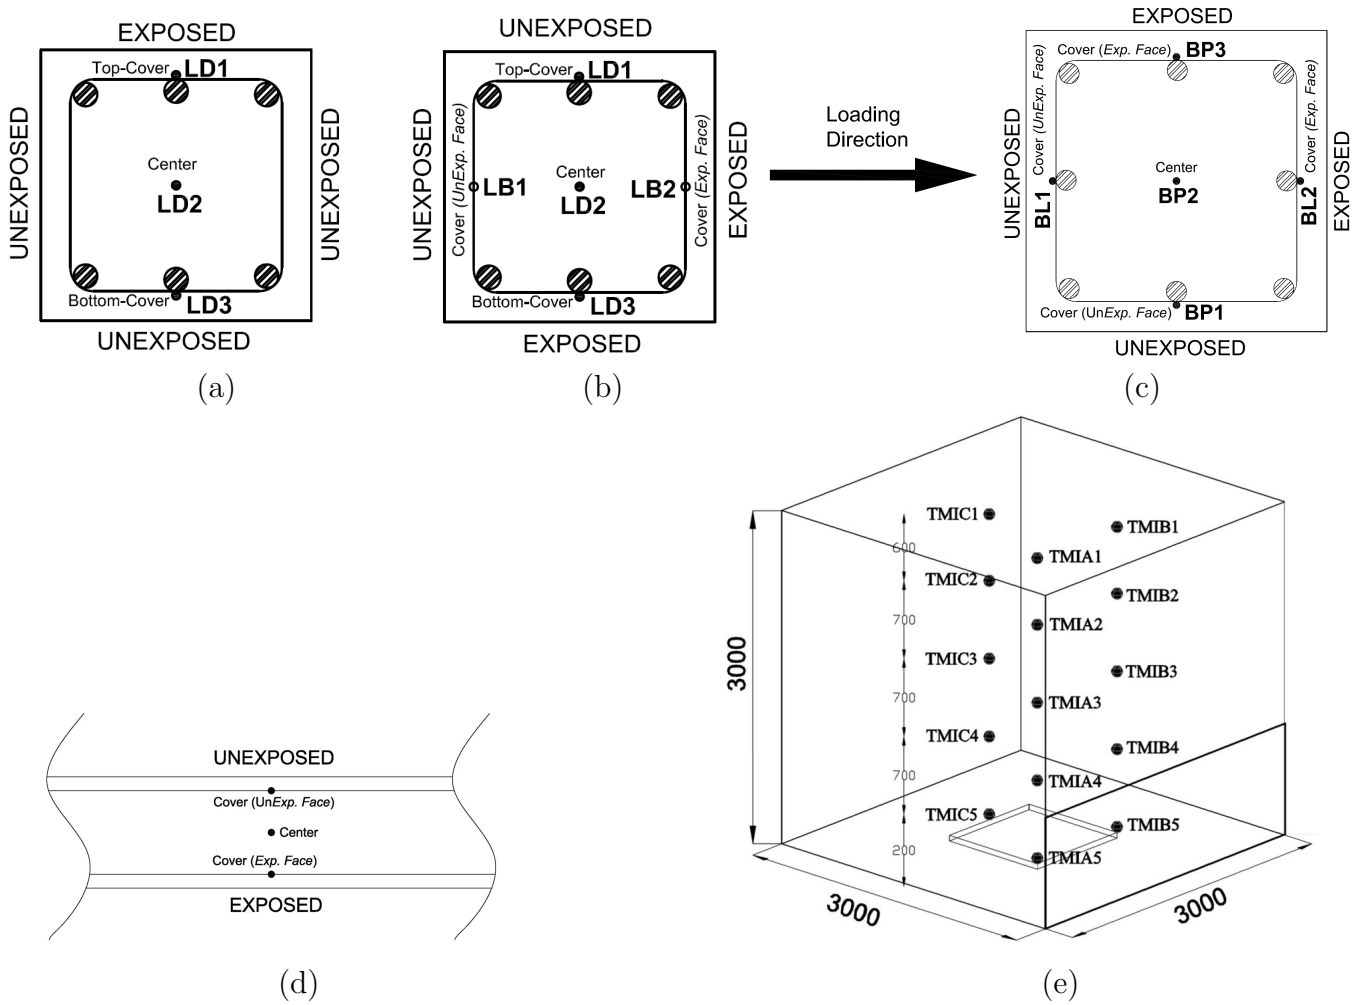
Location of thermocouples (a) Floor beam (b) Roof beam (c) Column (d) Slab (e) Compartment
